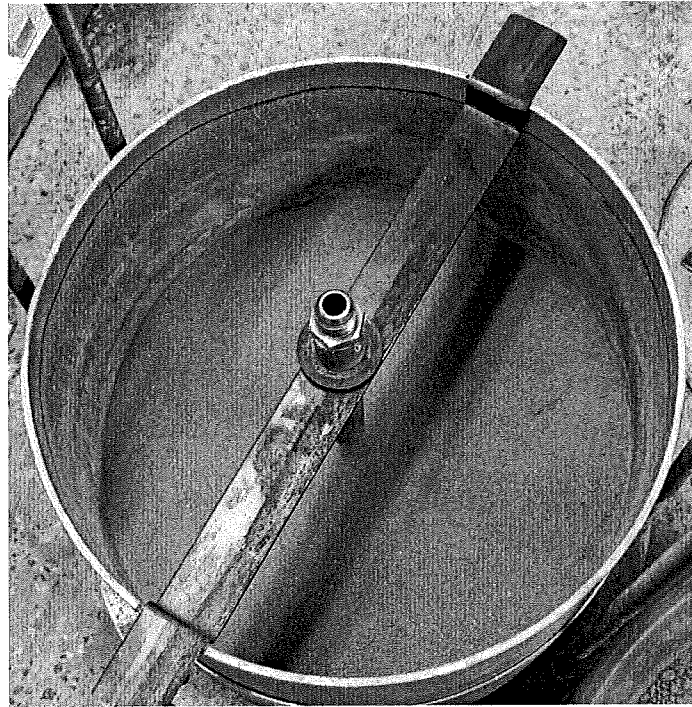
Placement of grouting pipe during filling sand into the test tank
